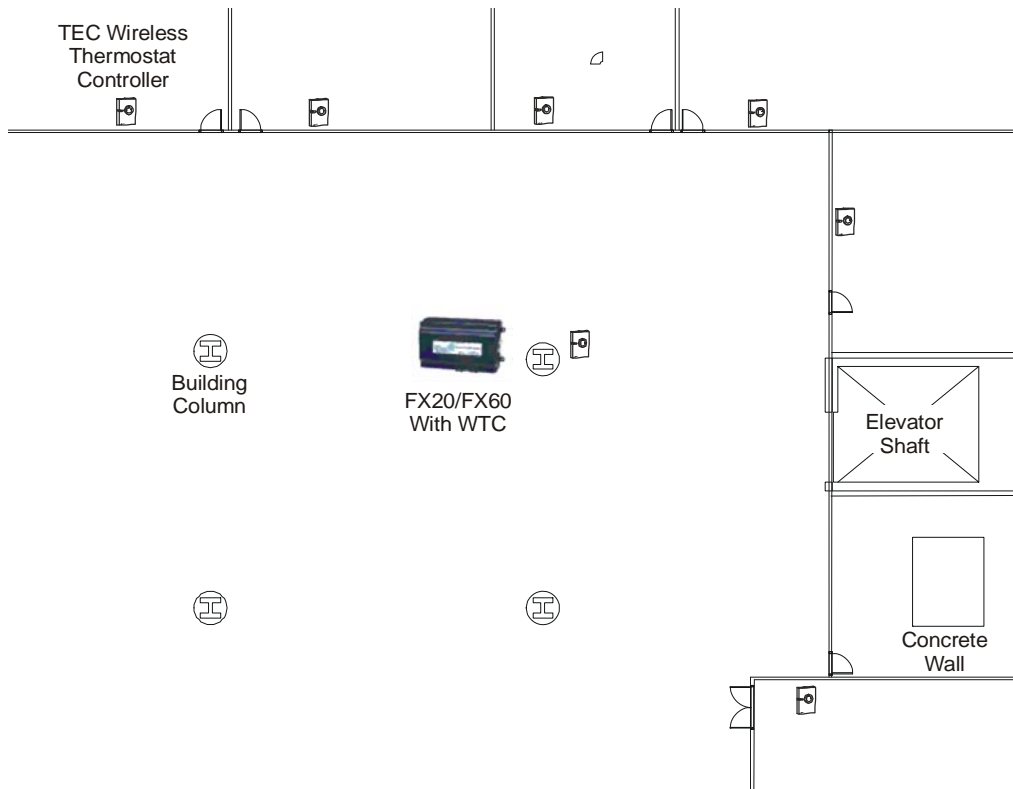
Building Floor Plan with TEC Wireless Thermostat Controller System
